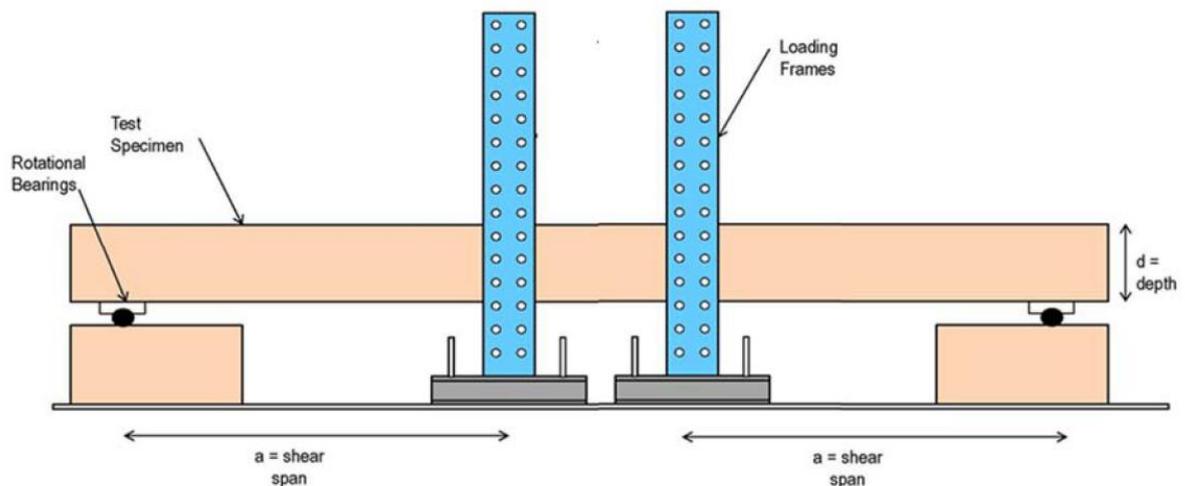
Out-of-Plane Shear Test Schematic Sketch
